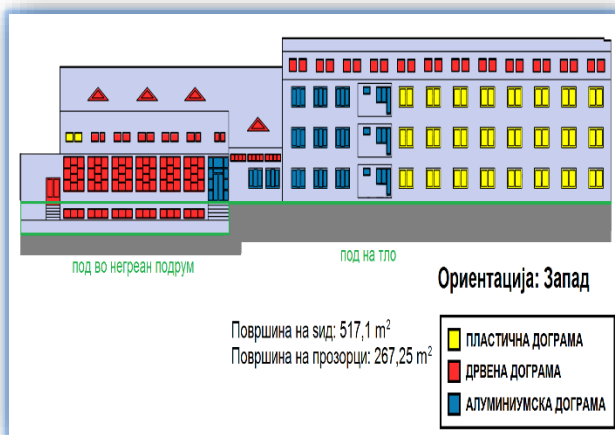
Dormitory's western façade – Total area without windows 517,1 m²; red colored windows are with double glazing and wooden carpentry; yellow colored are with PVC carpentry and double thermopan glazing with inert gas filling, while blue colored windows are with aluminum carpentry and thermopan glazing.
